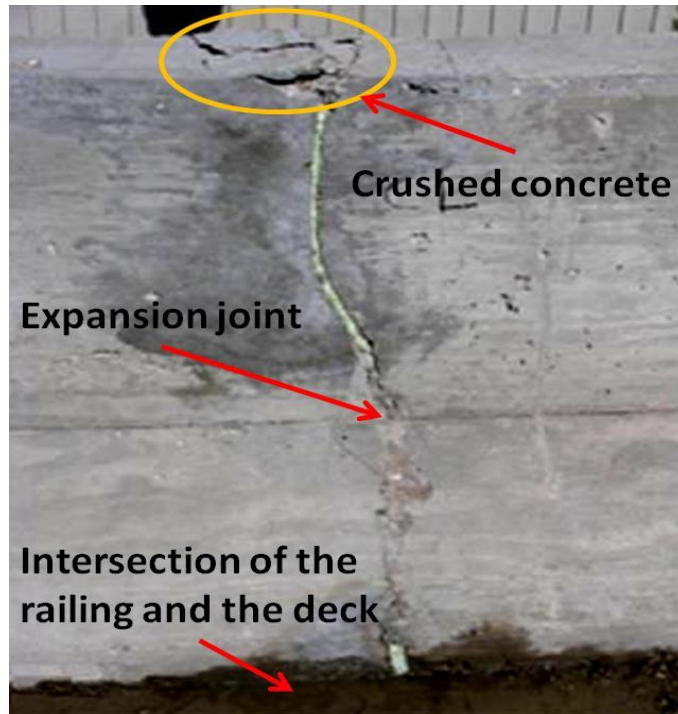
Crushed concrete at the CL exterior railing after Test 2
